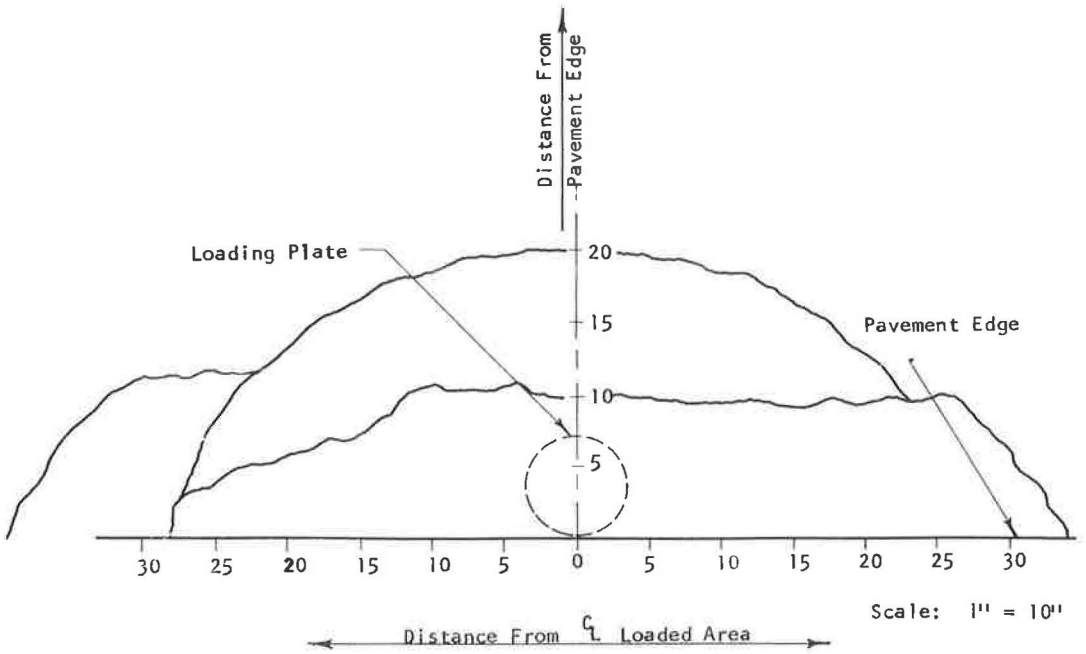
Load No. 5: crack pattern on surface of pavement at end of static load test.
